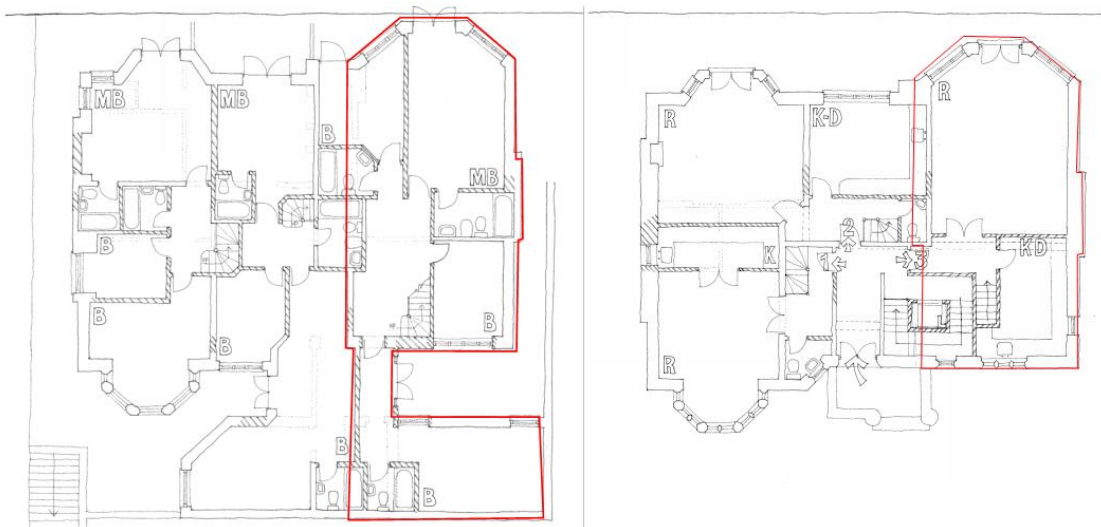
Approved 1988 ground and lower ground floor plans showing conversion to three duplex apartments. Outline of the existing flat shown in red,
